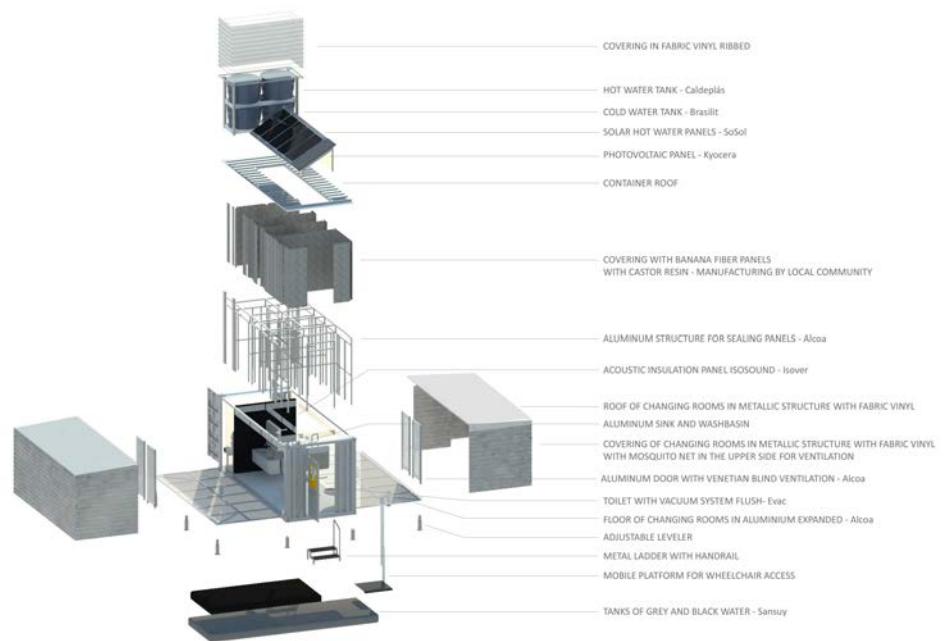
Exploded view of the APIS Project (Drawing of the NOAH Collection, 2014).
